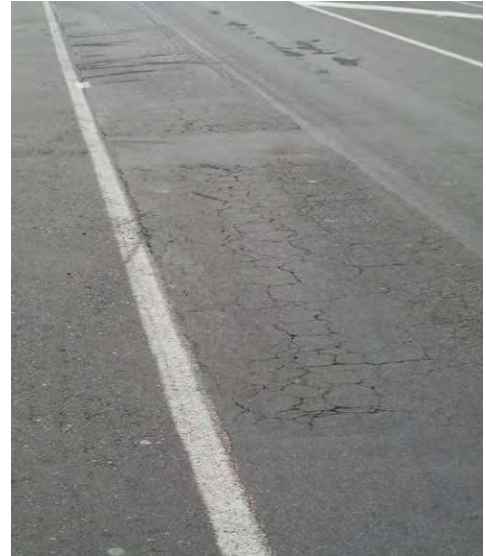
Pavement cracking (Waiwhetu Rd.)
